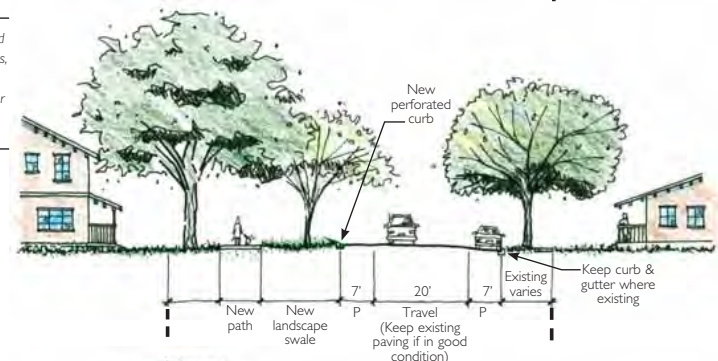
Alternative configuration for wide streets, showing sidewalks on both sides.
